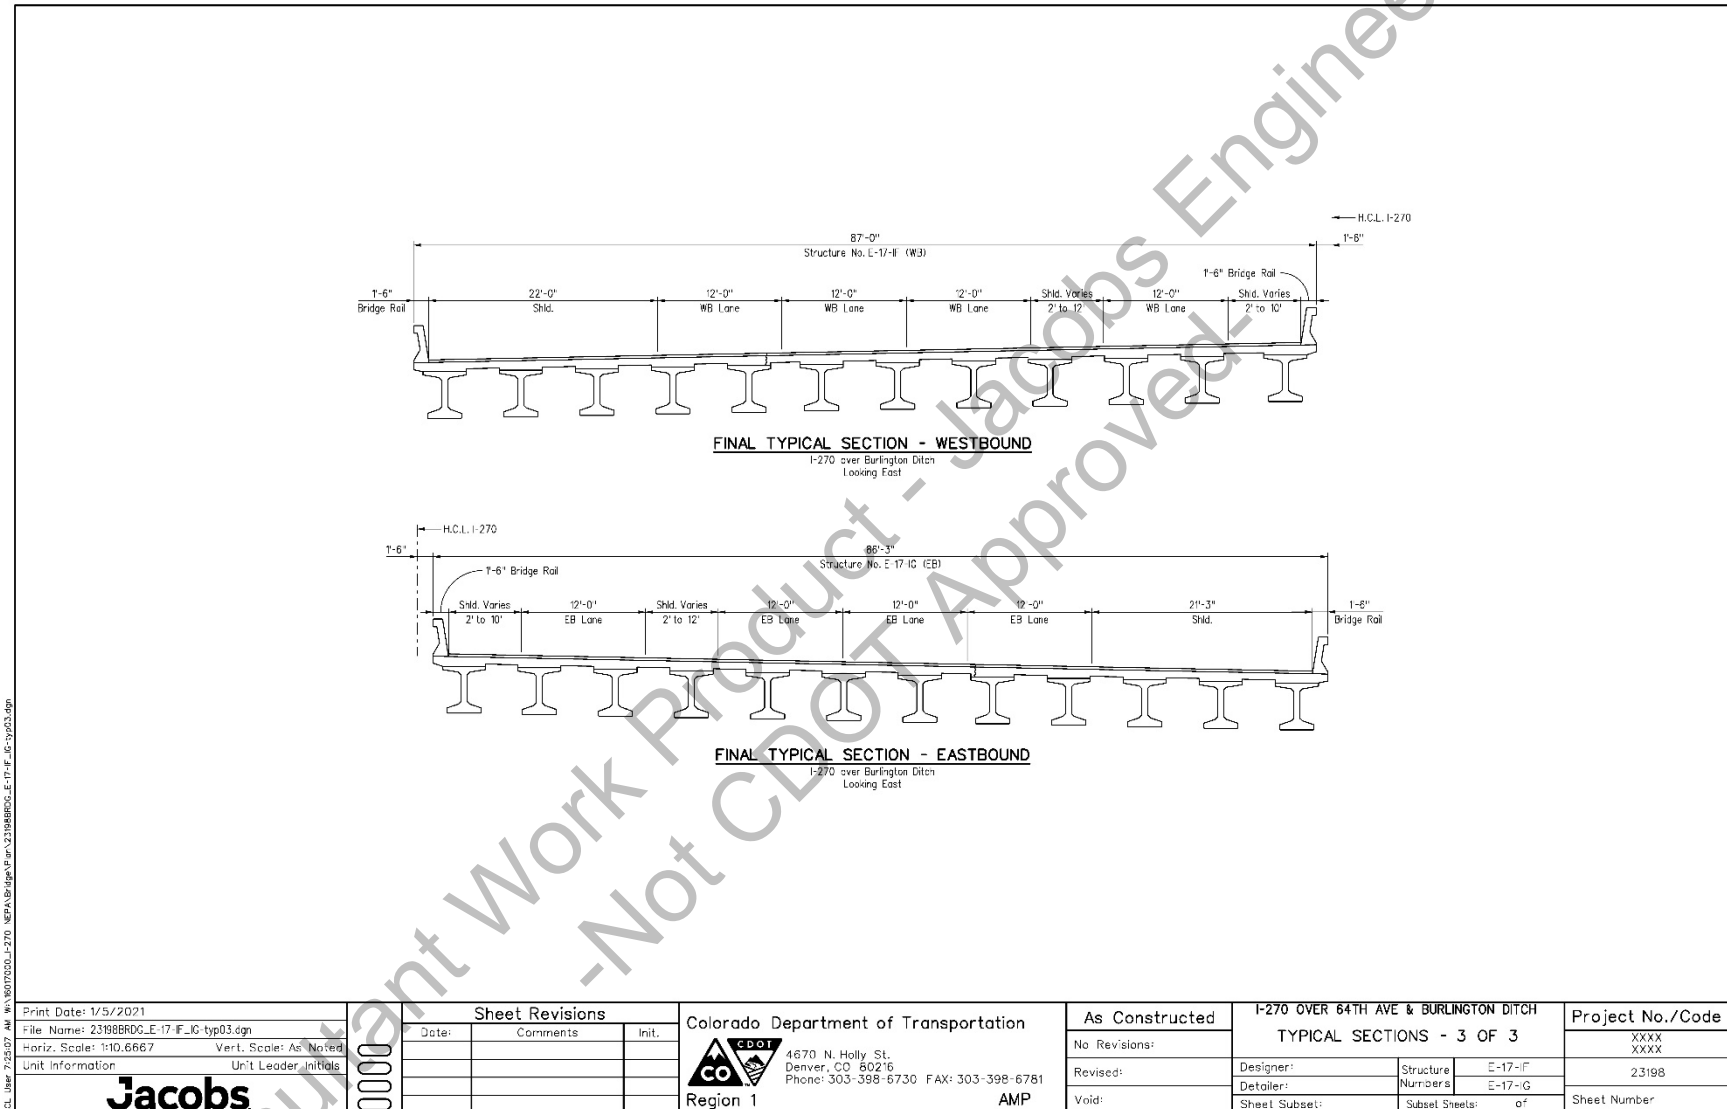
Final typical section of the proposed concrete girder spans over the Burlington Ditch/O'Brien Canal.
